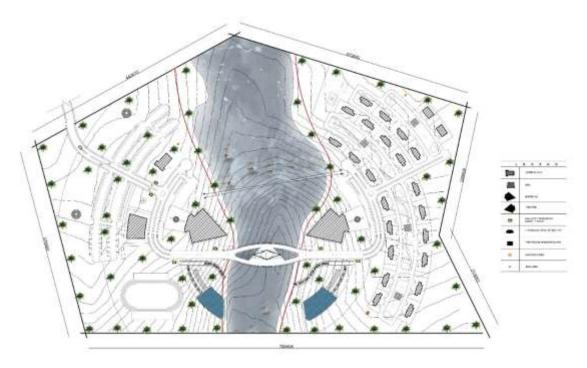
Proposed site plan Source: Author's work, (2021)
